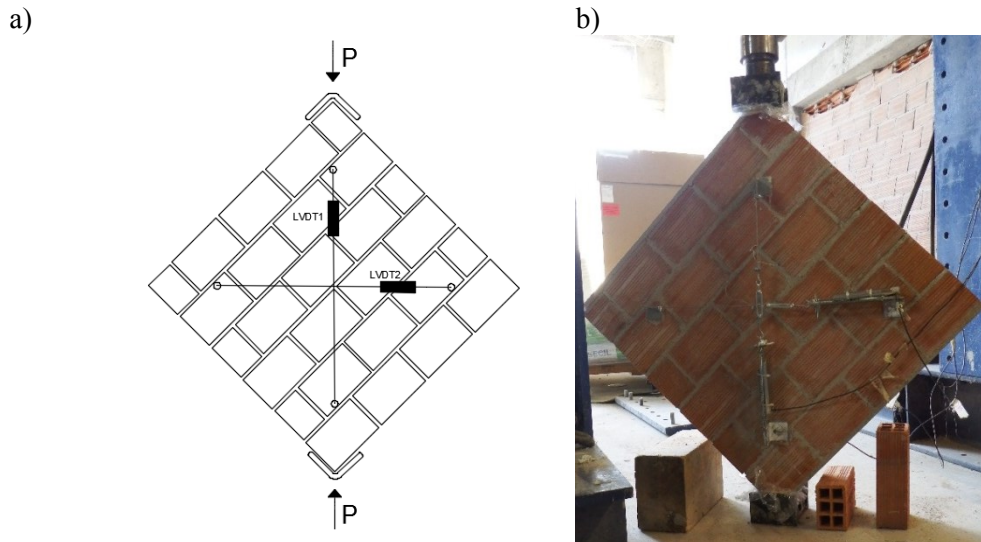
Diagonal shear test of masonry specimens a) scheme b) view of the specimen before testing
